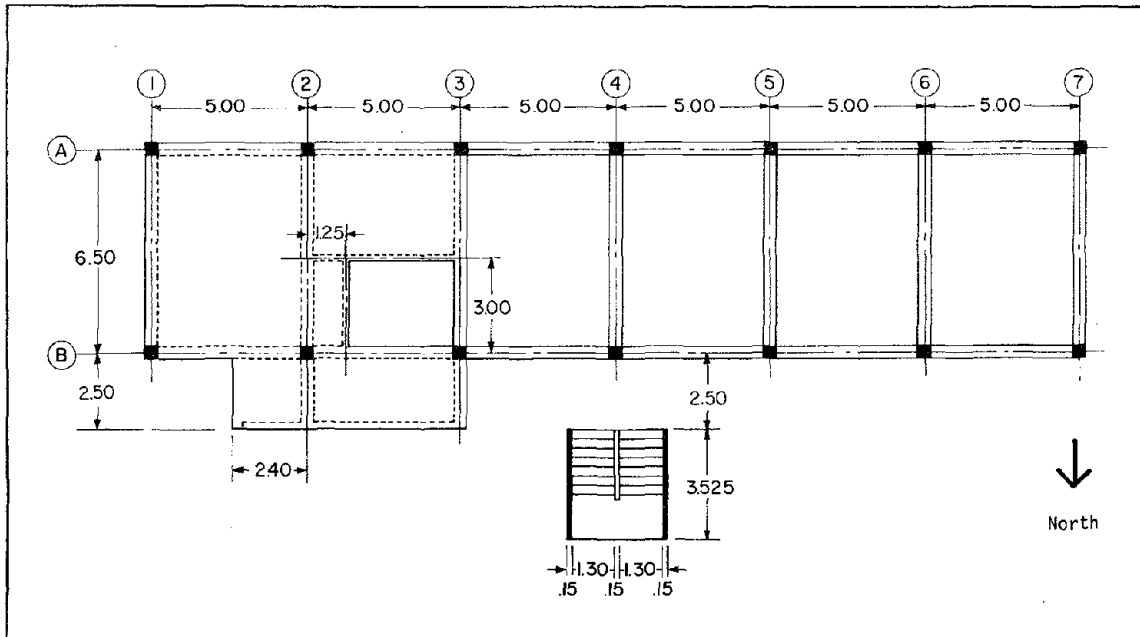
STRUCTURAL PLAN OF THE ESCUELA DE NIÑERAS
